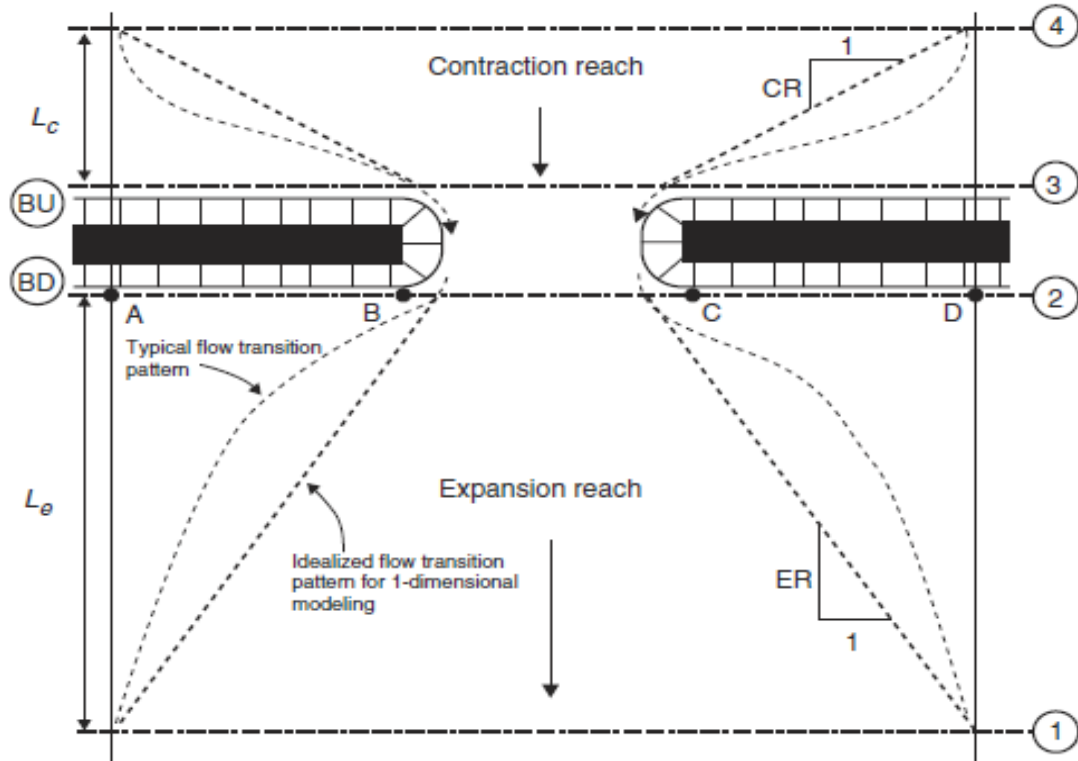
Layout of cross-section for modeling bridges using HEC-RAS (after US Army Corps of Engineers, 2002)
